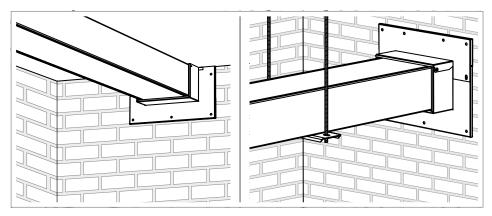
Wall connection collar PLM WC... 3-sided and 4-sided
